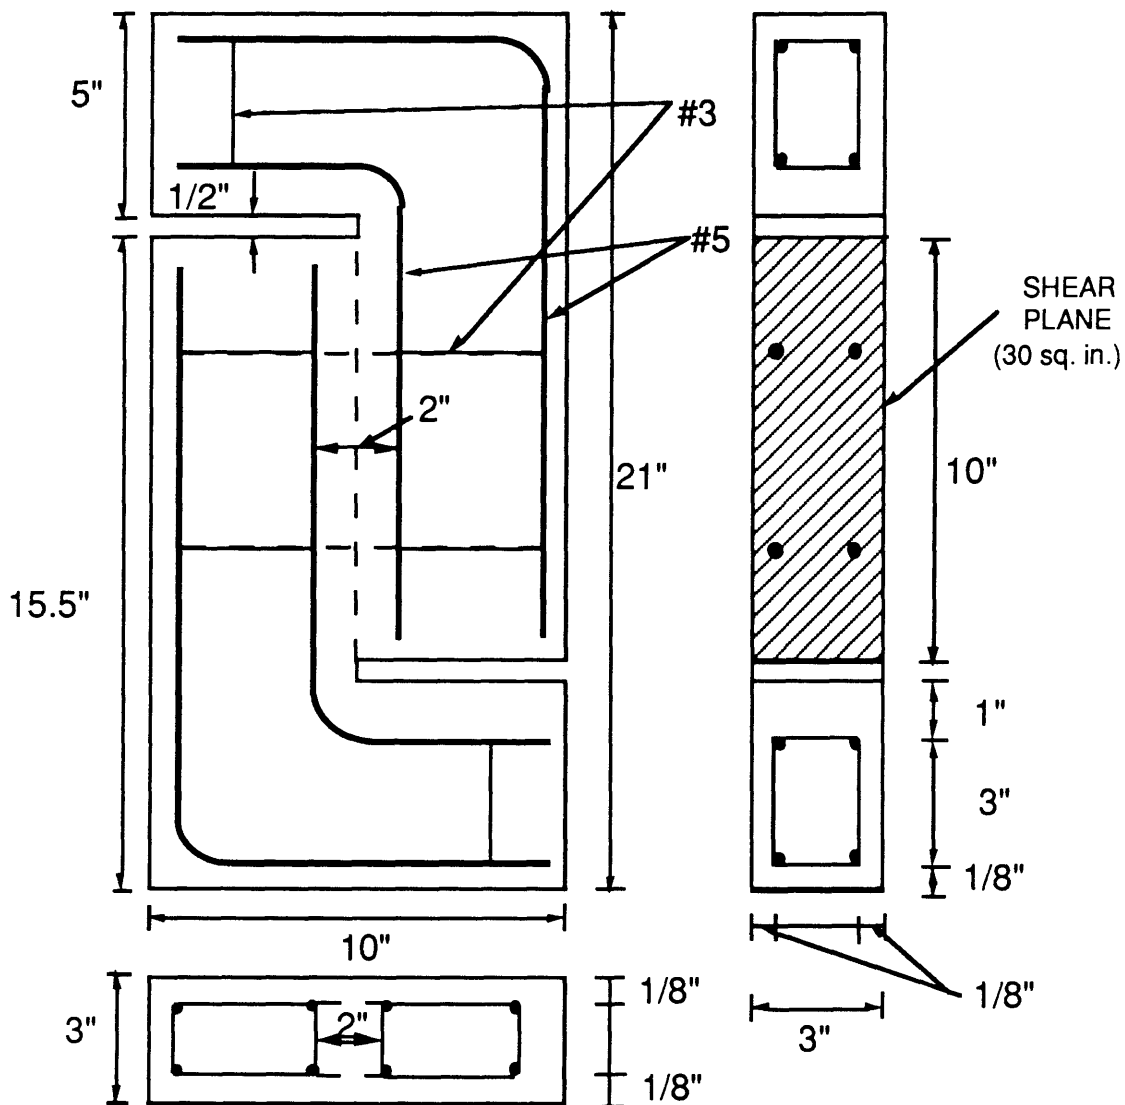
Steel bar reinforcement distribution for push-off specimen.
